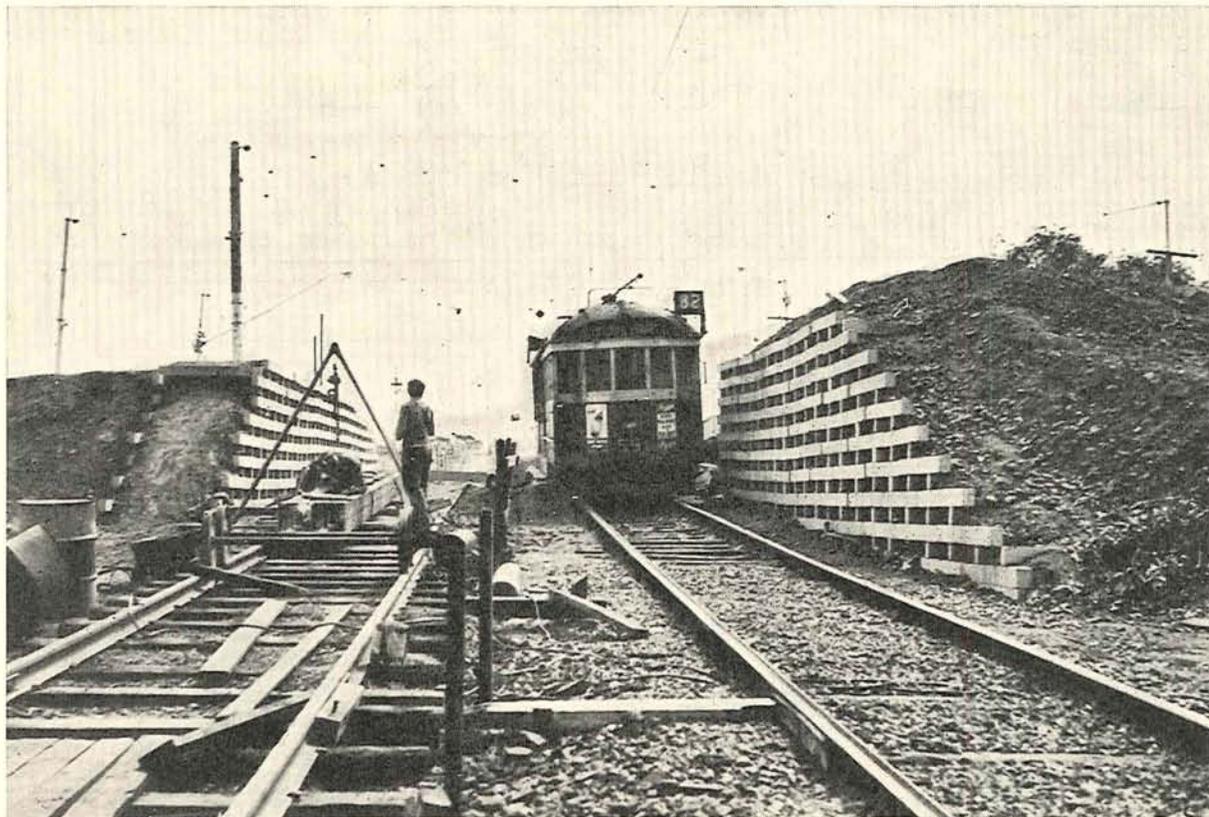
Surcharge behind crib walls during construction of Raleigh's Road Bridge.
